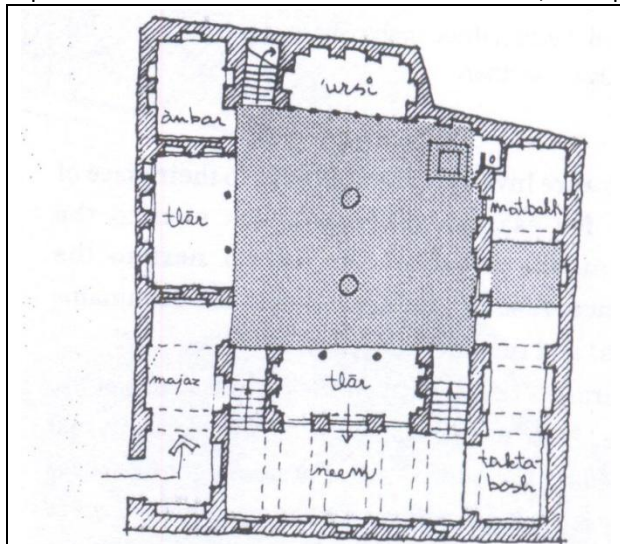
Ground Floor Plan of a larger Baghdad House (Source: 6000 years of Housing by Norbert Schoenauer)
